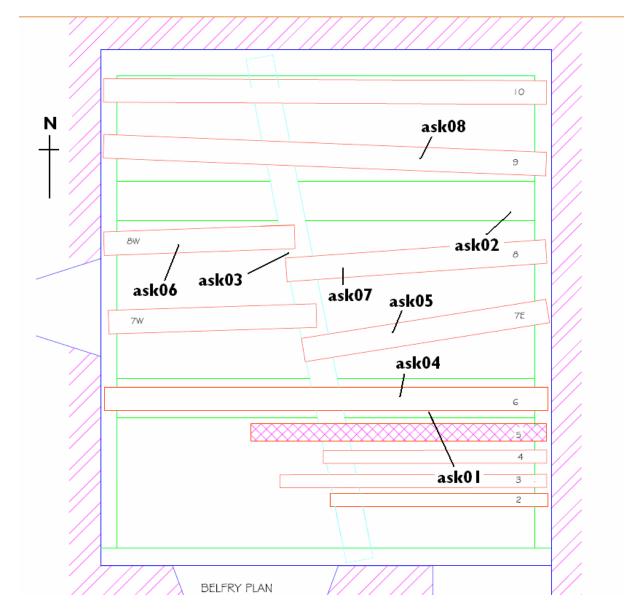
Plan of the belfry floor, showing the timbers sampled.
